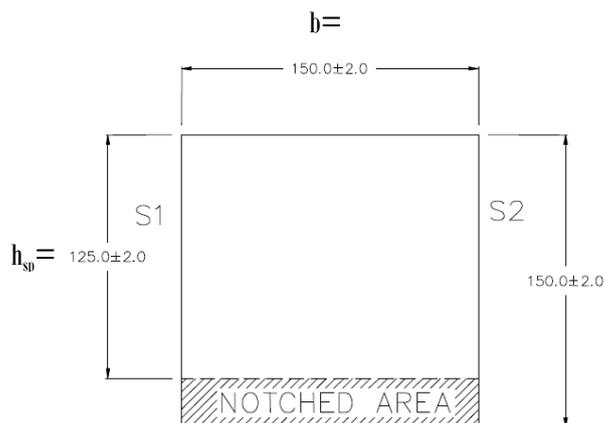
Cross-section specimen. RILEM, bending tests and interpretation
